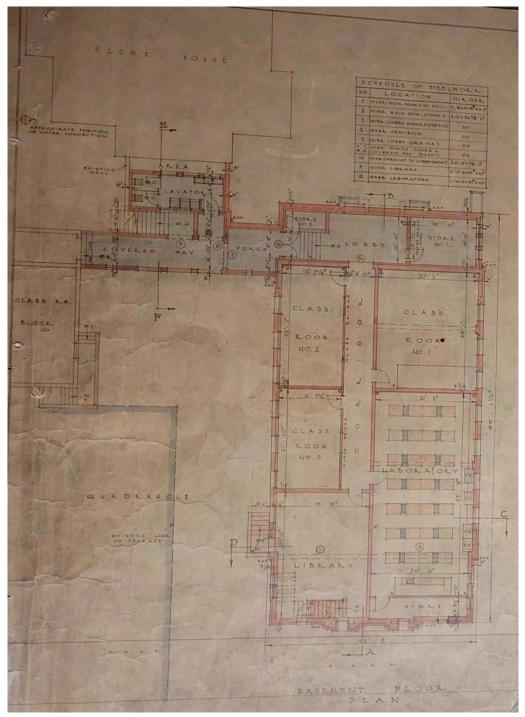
Basement plan for 'Assembly Hall and New Classrooms' at Barker College, prepared by John K. Shirley, architect, dated January 1938. (Source: Barker College Archives, Plan M0009A).
